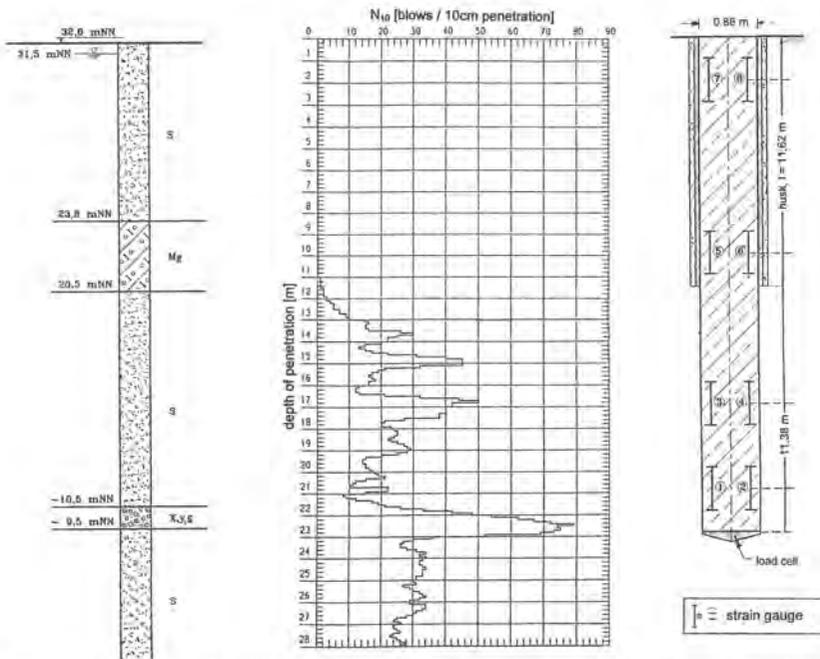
Ground situation and bored test pile-equipped with strain gauges and load cell · Potsdamer Platz · Berlin.
